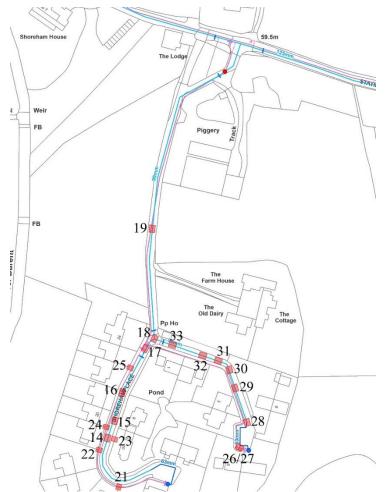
Plan of pits 14-19 & 21-33 excavated on Shoreham Place
